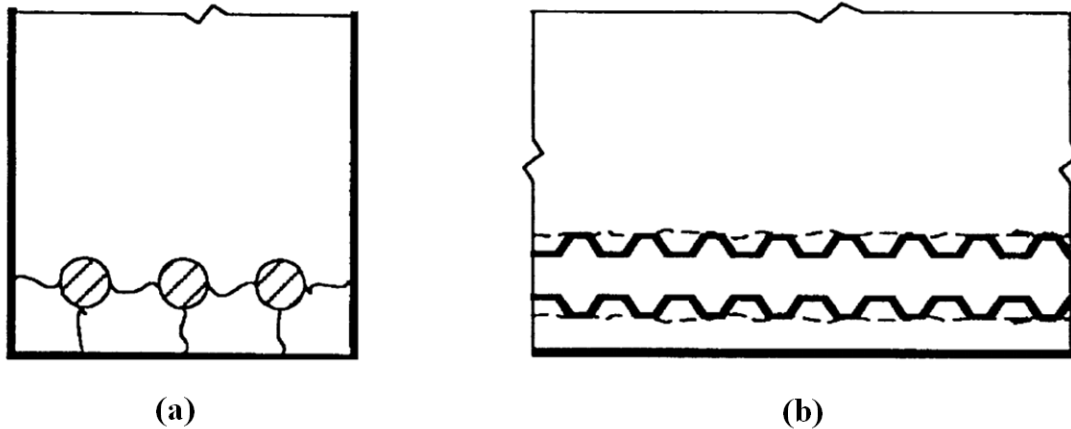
Cracking and damage mechanisms in bond: (a) end view of a member showing splitting cracks between bars and through the concrete cover; and (b) side view of member showing shear crack and/or local concrete crushing due to bar pullout (ACI 408, 2003)
